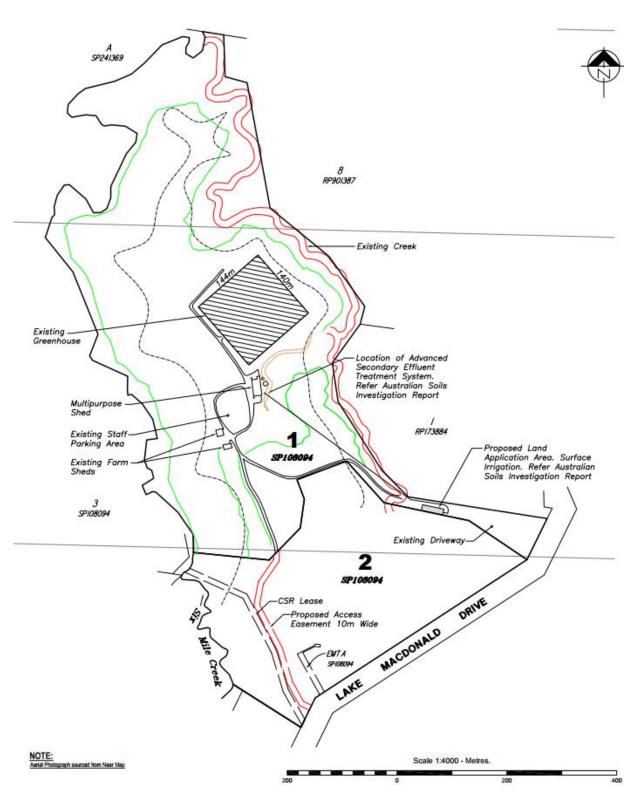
Site plan of the greenhouse and access easement at 271 & 305 Lake Macdonald Road.
